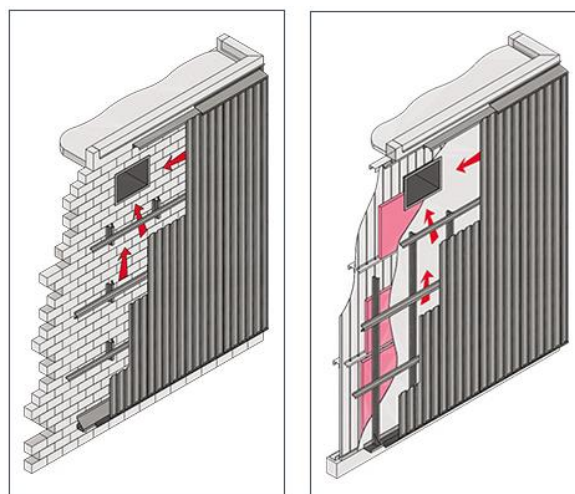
On the left, SolarWall panels on typical block wall construction. On the right, SolarWall panels on typical metal wall construction.
